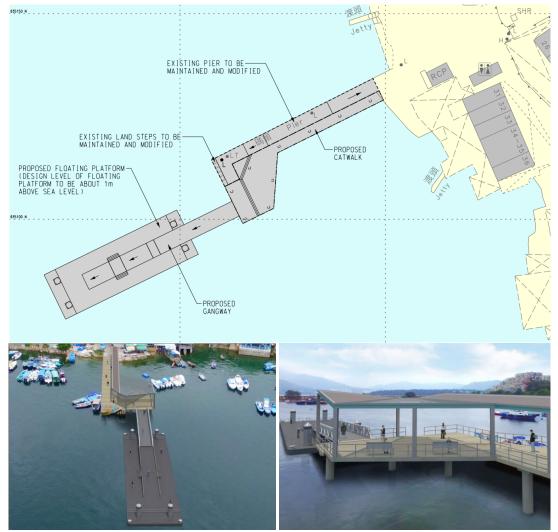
Layout and Photomontages of Proposed Sam Mun Tsai Pier
